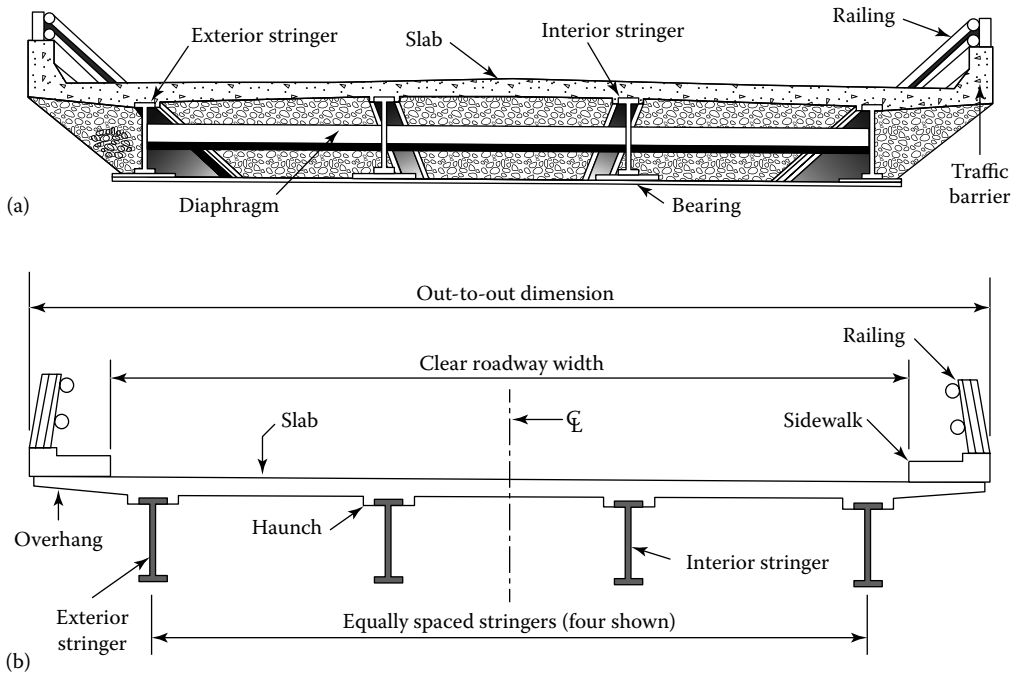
Typical slab–steel beam superstructure: (a) without a sidewalk and (b) with a sidewalk.
